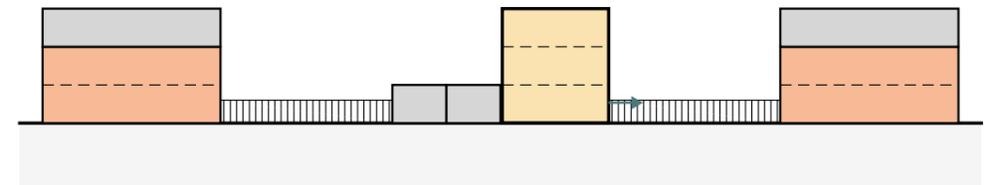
New side street development on secondary streets should be subservient to the properties either side, and no taller than the highest point of those buildings.
